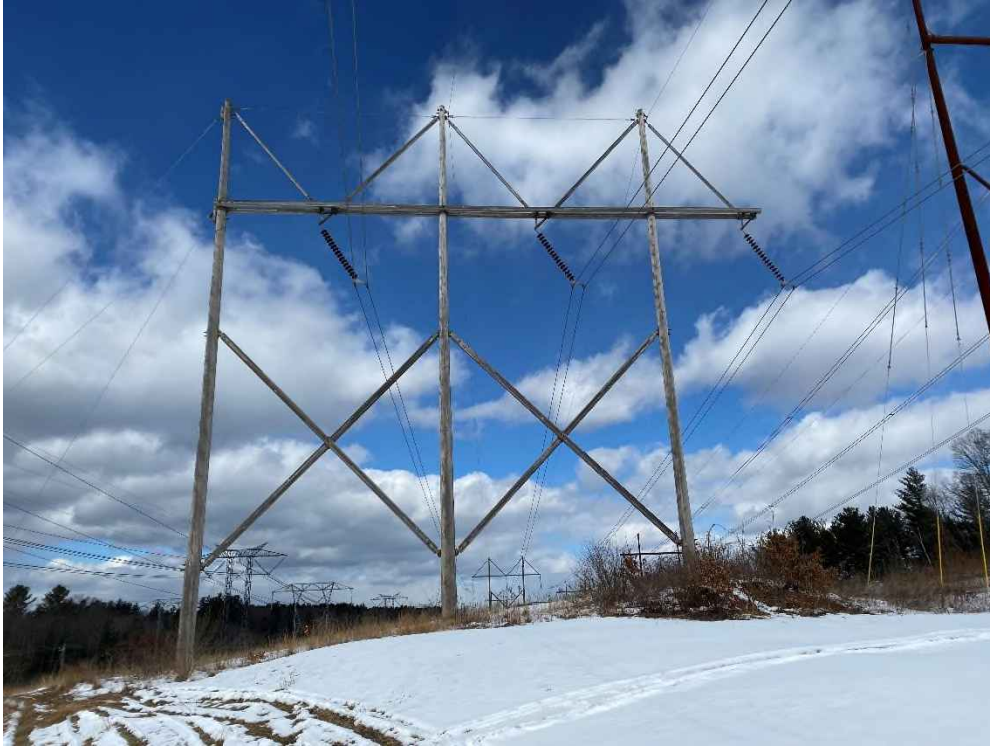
Looking at proposed access adjacent to Structure 55 of the 380 Line from Wiley Hill Road.
